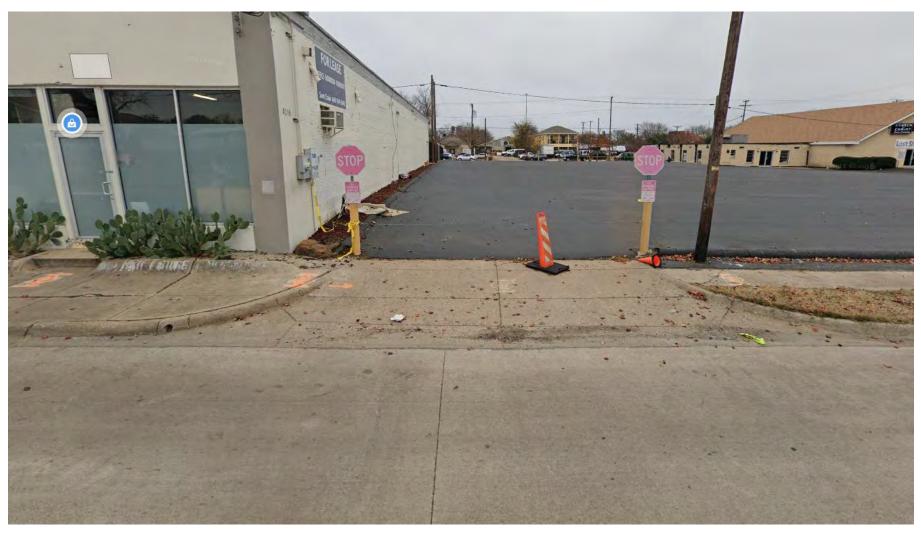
Narrow sidewalk sections and poor pavement conditions along segment.
